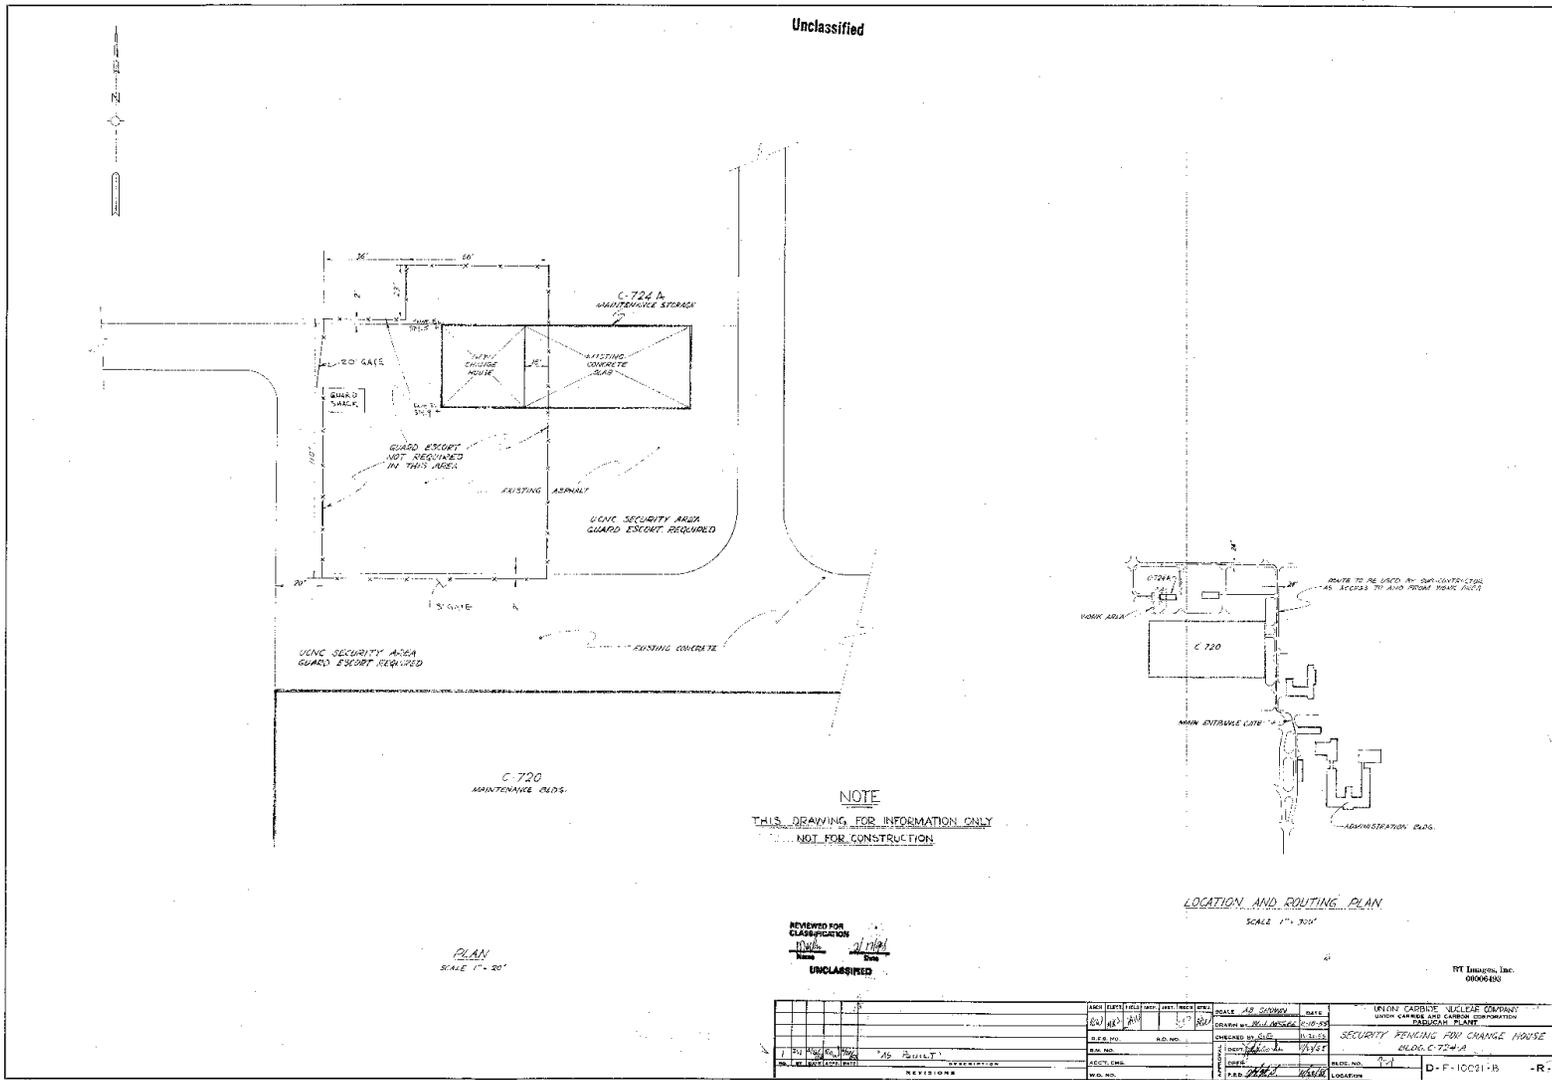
Engineering Drawing D-F-10021-B Rev. 1 Showing C-724-A
